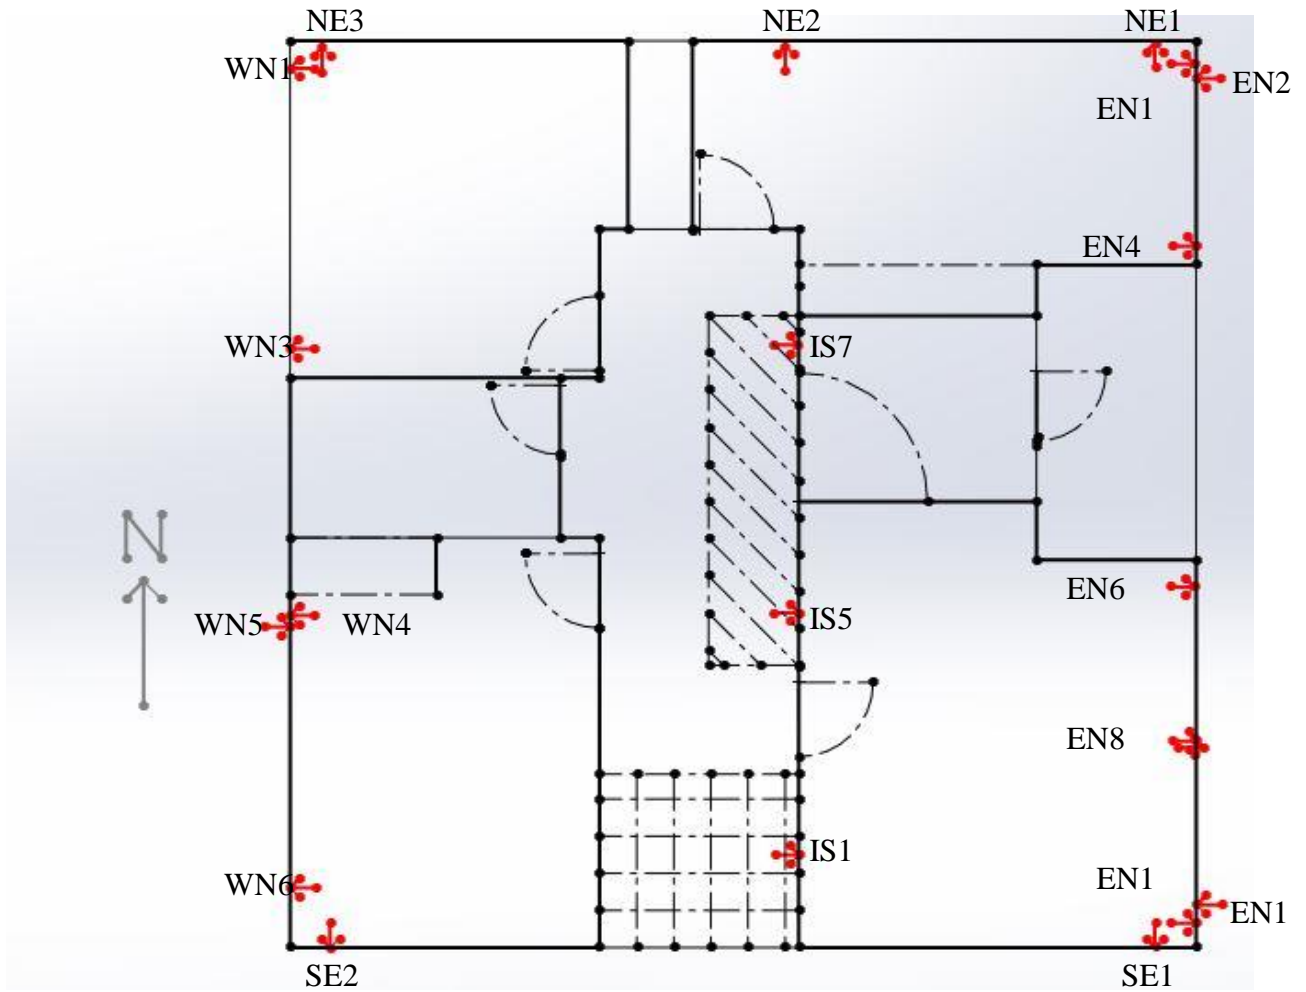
Instrumentation plan for the test with the brick veneer in place.
